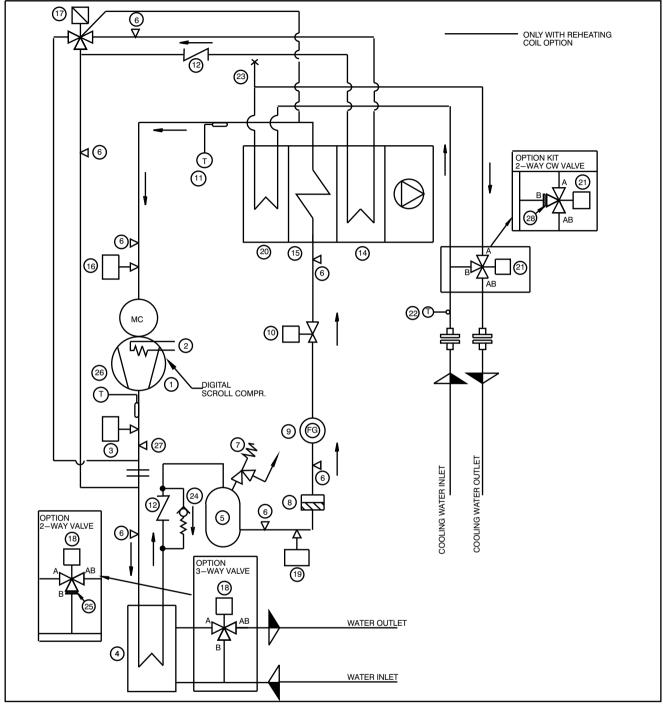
Refrigerant circuit H version - Single circuit - Single DIGITAL SCROLL compressor - TXV
